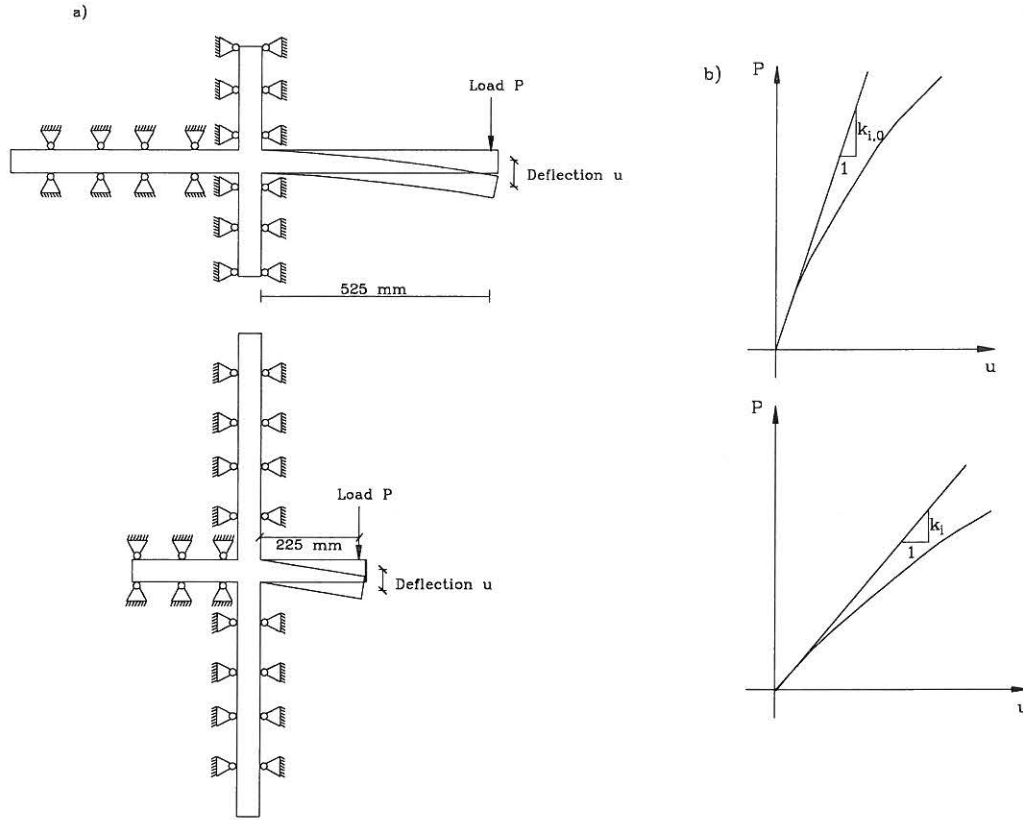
a) Schematic view of the test set-up used for the static testing of beams and columns. b) Definition of initial stiffness of undamaged and damaged specimen.
